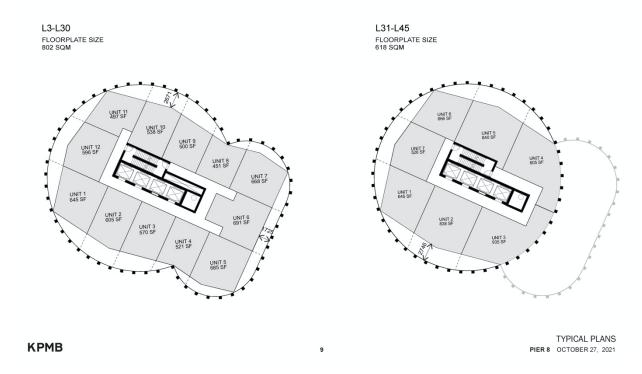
Typical Floor and Balcony Plans (KPMB Architects)
